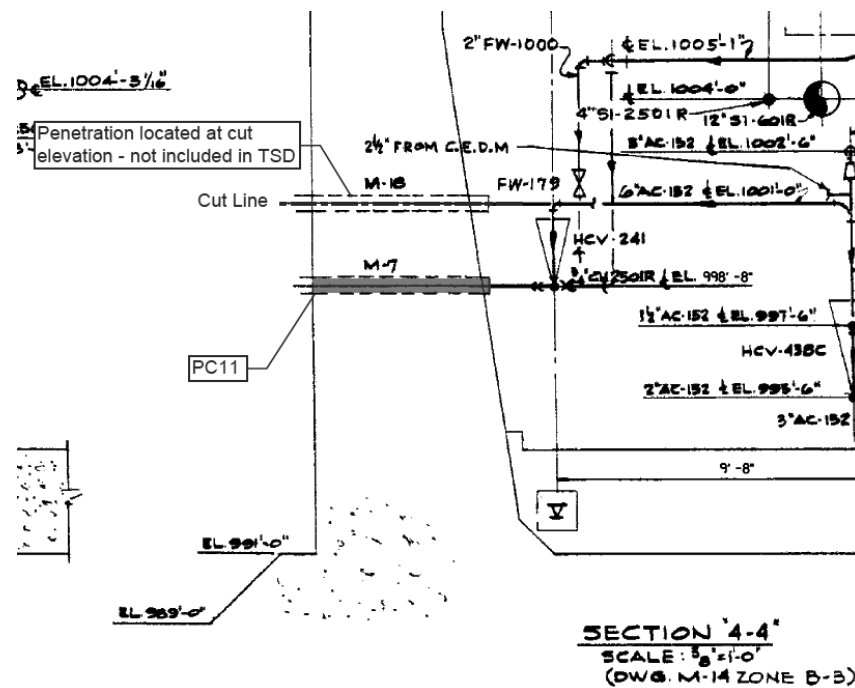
Containment Wall Penetration Section 4-4 View (10588)
